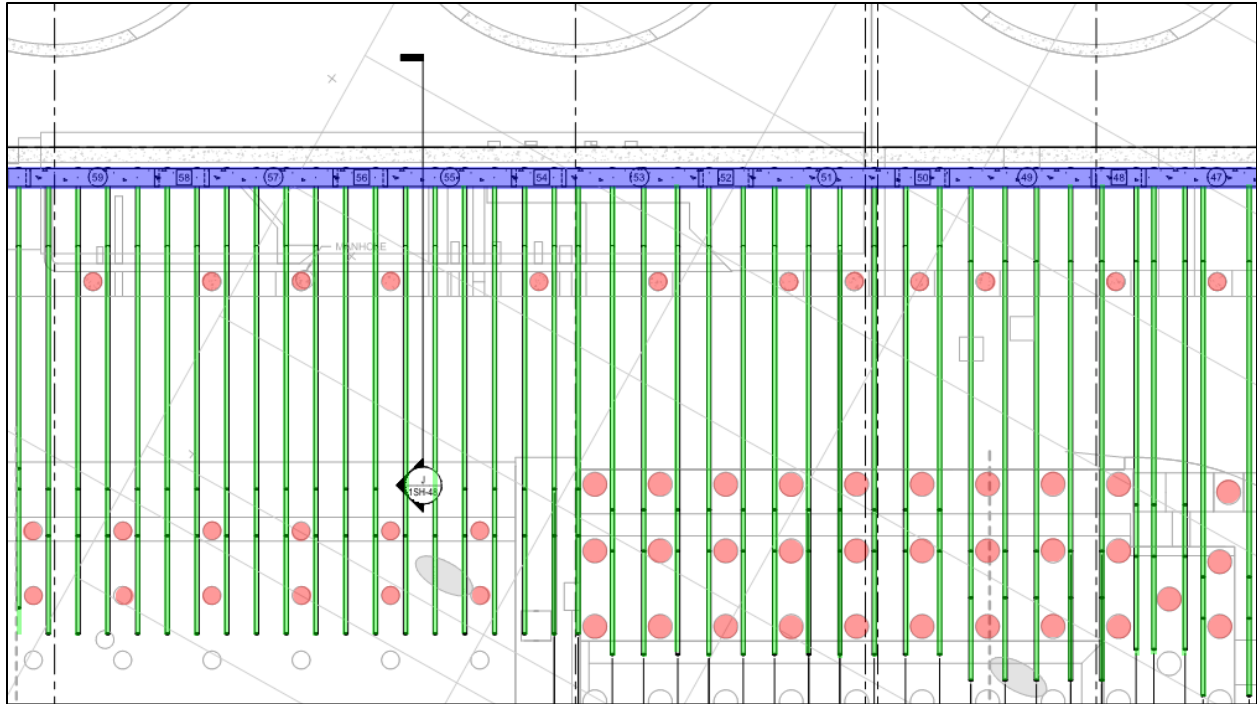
Plan view of diaphragm wall and designed tieback locations relative to existing pile foundations.
